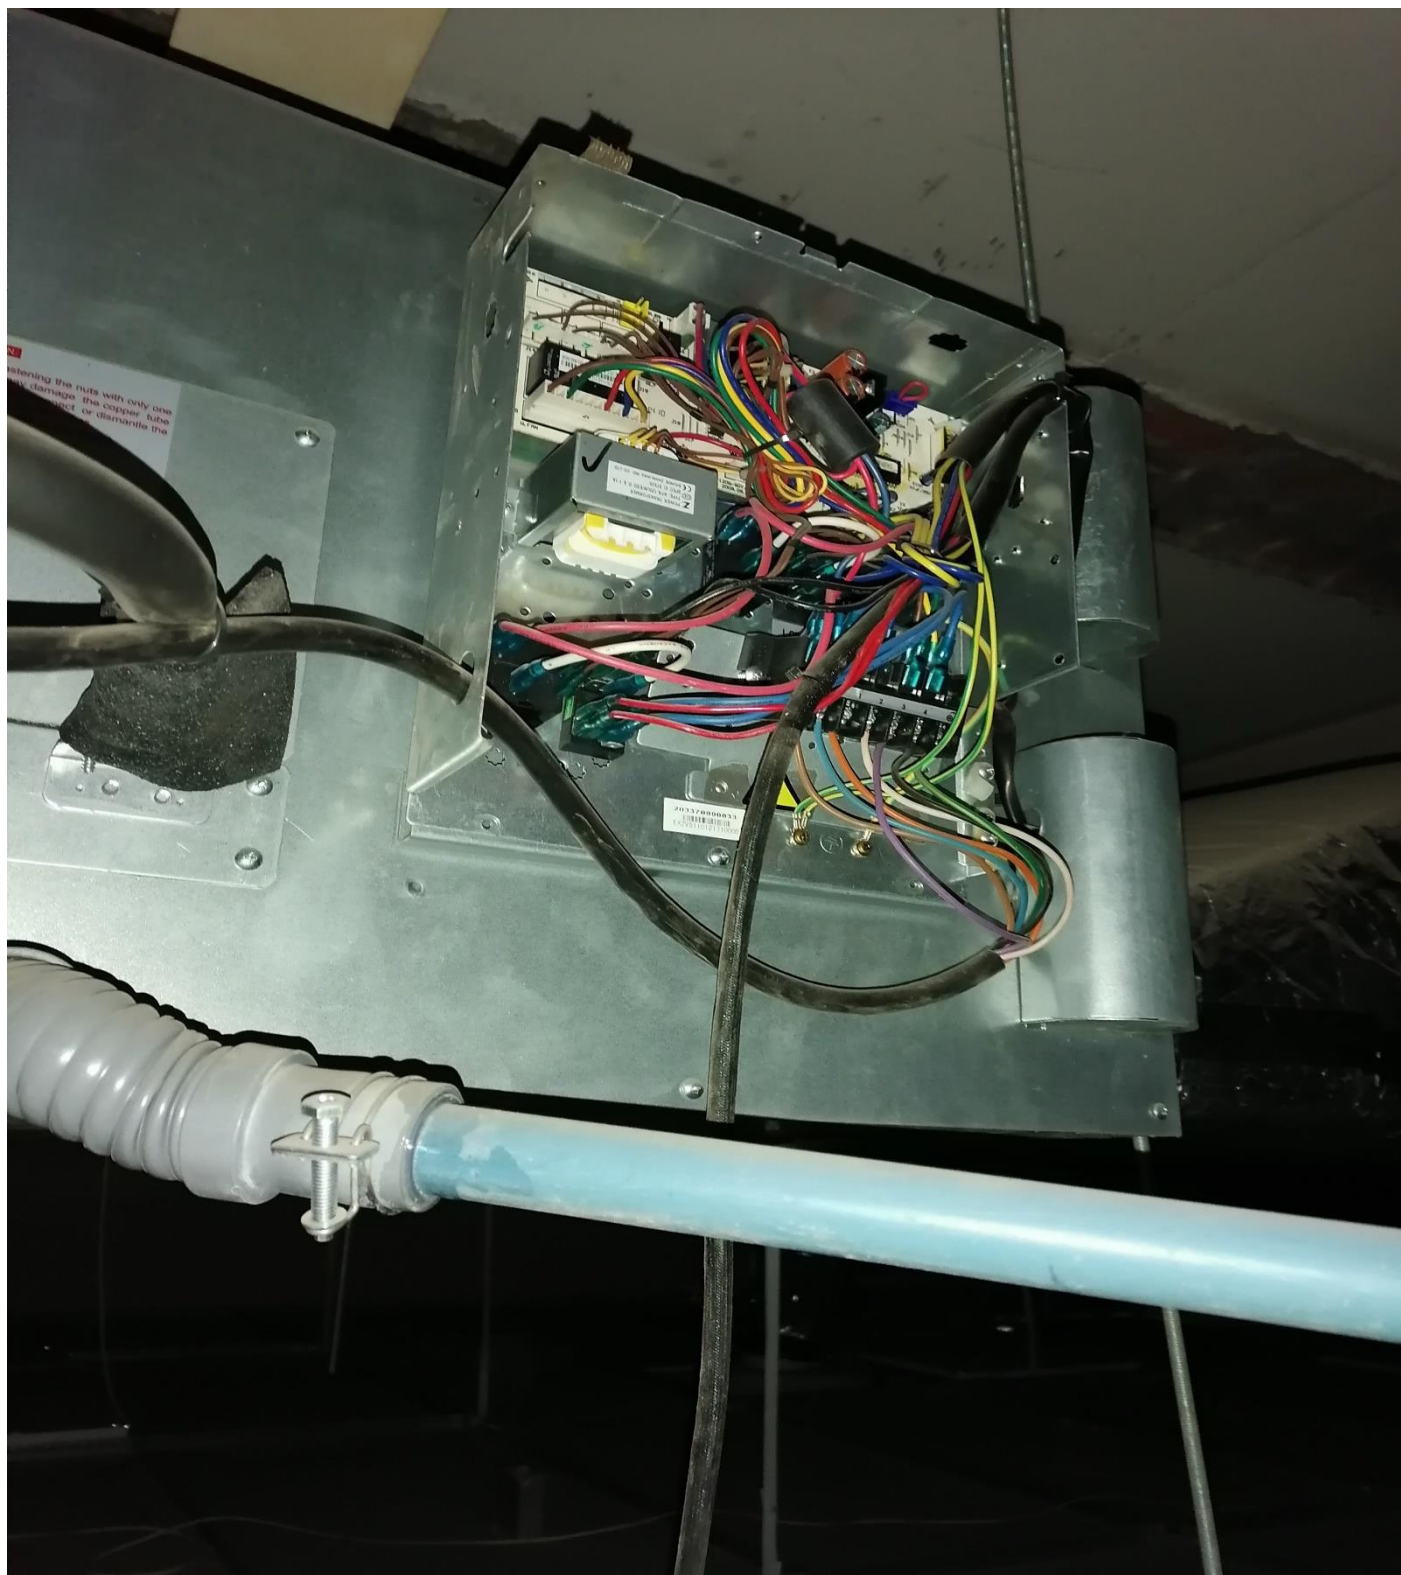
Single core cables loosely hanging from the open trunking – Office 7 & 8 ceiling Void.
